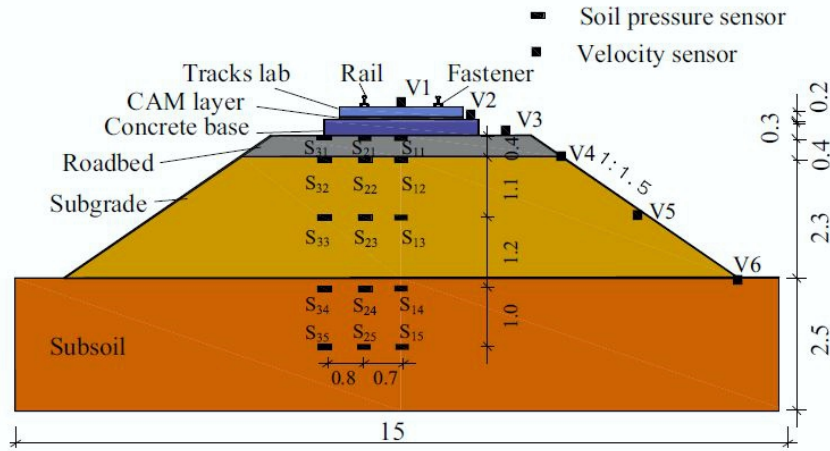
A diagram used of full-scale model of ballastless slab track in m, Bian et al. (2014)
